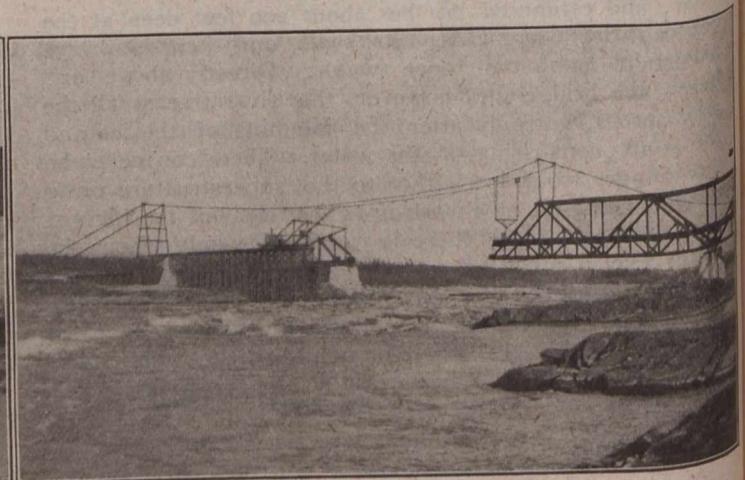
View of Cableway; and Beginning of Erection of Northern Anchor-span, with Traveller at Floor-level
